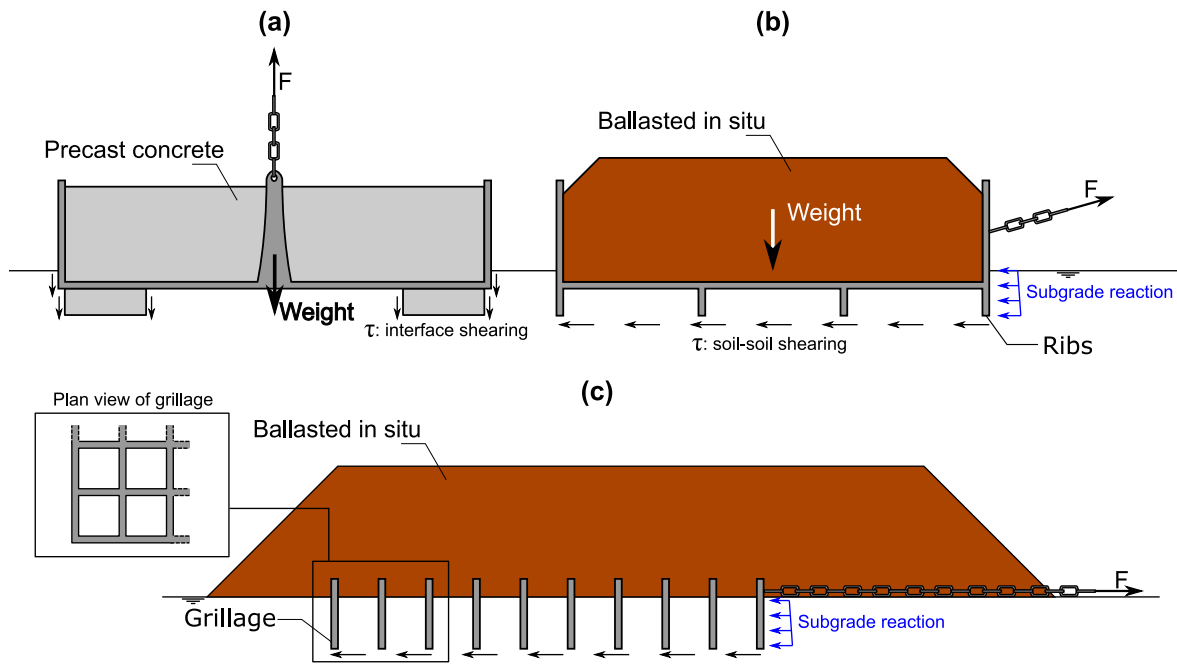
Gravity anchors (a) Precast concrete anchor, (b) box anchor, and (c) grillage and berm anchor (after Randolph and Gourvenec, 2011).
